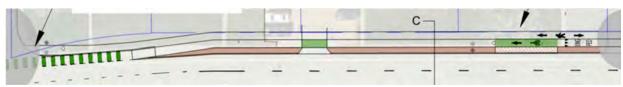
PROPOSED 30TH STREET IMPROVEMENTS
